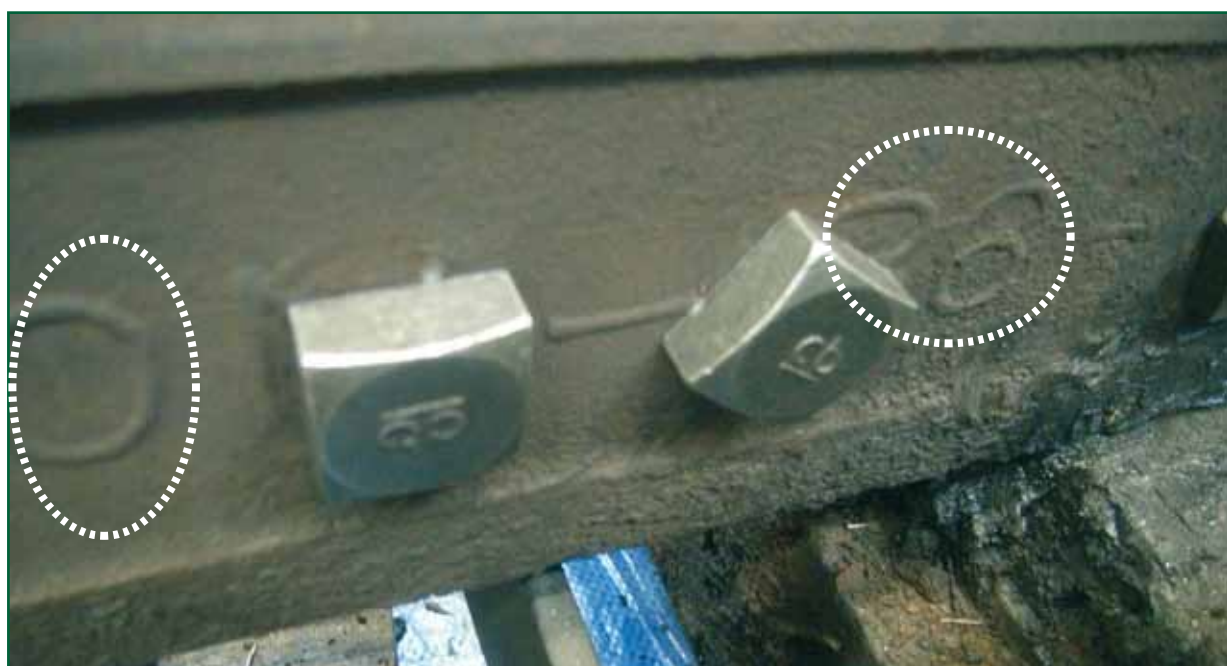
Rail branding on left-hand switch rail (Note: new bolts added for testing purposes)
